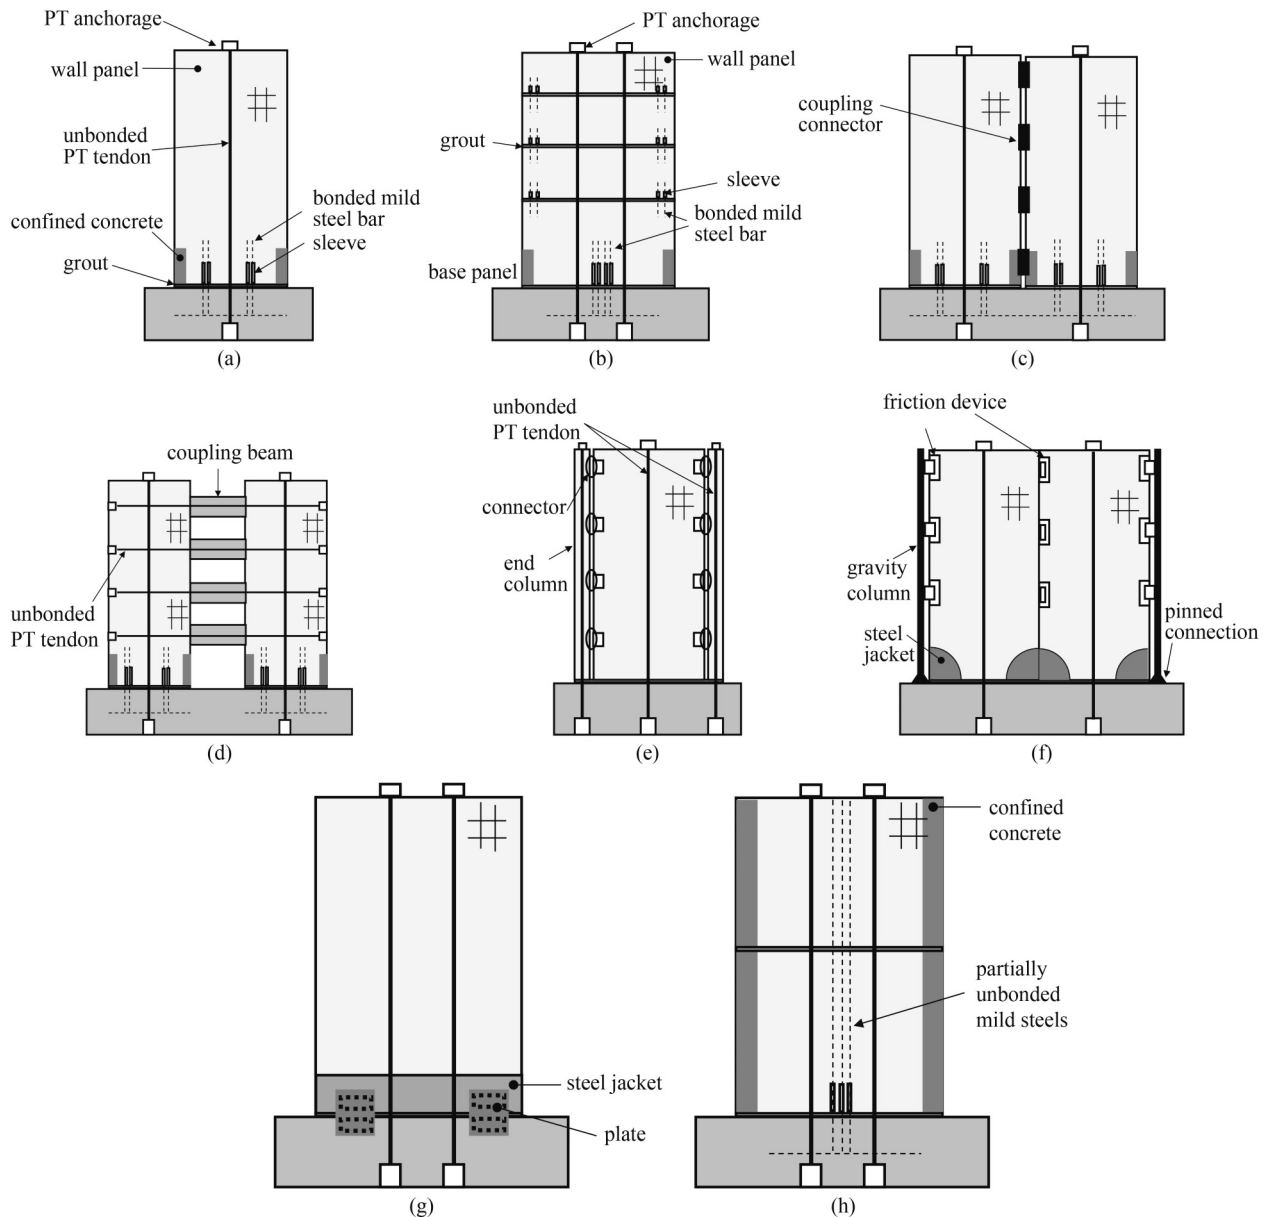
Precast concrete walls configurations: (a) single panel wall adapted from Kurama et al. [18] (Used with permission of American Society of Civil Engineers, from Seismic-resistant precast concrete structures: State of the art, Kurama Y C, Sritharan S, Fleischman R B, Restrepo J I, Henry R S, Cleland N M, Ghosh S K, Bonelli P, 144, 4, 2018, permission conveyed through Copyright Clearance Center, Inc.); (b) multipaneled wall adapted from Kurama et al. [18] (Used with permission of American Society of Civil Engineers, from Seismic-resistant precast concrete structures: state of the art, Kurama Y C, Sritharan S, Fleischman R B, Restrepo J I, Henry R S, Cleland N M, Ghosh S K, Bonelli P, 144, 4, 2018, permission conveyed through Copyright Clearance Center, Inc.); (c) coupled wall with vertical joint adapted from Kurama et al. [18] (Used with permission of American Society of Civil Engineers, from Seismic-resistant precast concrete structures: state of the art, Kurama Y C, Sritharan S, Fleischman R B, Restrepo J I, Henry R S, Cleland N M, Ghosh S K, Bonelli P, 144, 4, 2018, permission conveyed through Copyright Clearance Center, Inc.); (d) coupled wall with coupling beams adapted from Kurama et al. [18] (Used with permission of American Society of Civil Engineers, from Seismic-resistant precast concrete structures: state of the art, Kurama Y C, Sritharan S, Fleischman R B, Restrepo J I, Henry R S, Cleland N M, Ghosh S K, Bonelli P, 144, 4, 2018, permission conveyed through Copyright Clearance Center, Inc.); (e) precast walls with end columns (preWEC) adapted from Henry et al. [55] (Reprinted from Engineering Structures, 115, Henry R S, Sritharan S, Ingham J M, Finite element analysis of the PreWEC self-centering concrete wall system, 28–41, Copyright 2016, with permission from Elsevier.); (f) coupled walls with friction devices adapted from Guo et al. [56] (Used with permission of American Society of Civil Engineers, from Seismic resilience upgrade of rc frame building using self-centering concrete walls with distributed friction devices, Guo T, Xu Z, Song L, Wang L, Zhang Z, 143, 12, 2017, permission conveyed through Copyright Clearance Center, Inc.); (g) repairable precast concrete shear wall; (h) hybrid reinforced shear wall adapted from Gu et al. [57] (Reprinted from Soil Dynamics and Earthquake Engineering, 116, Gu A, Zhou Y, Xiao Y, Li Q, Qu G, Experimental study and parameter analysis on the seismic performance of self-centering hybrid reinforced concrete shear walls, 409–420, Copyright 2019, with permission from Elsevier.).
